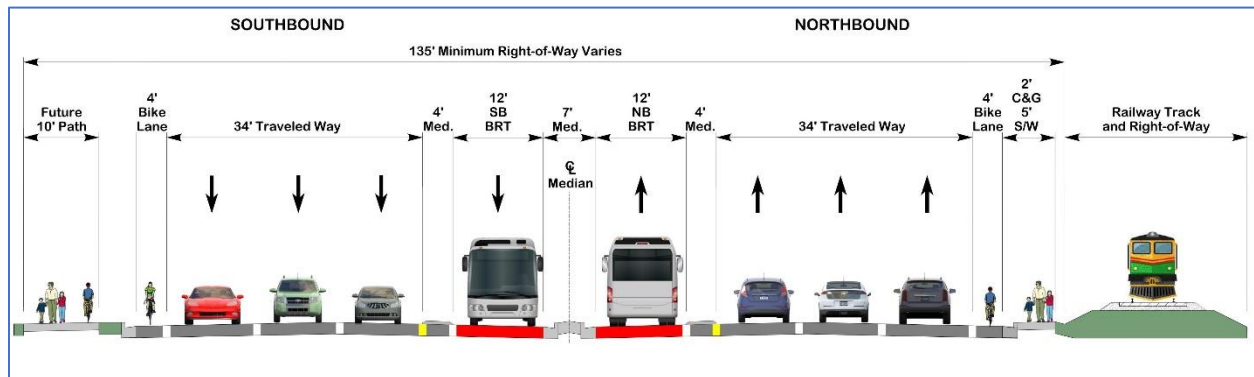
Proposed BRT Alignment within a 6-Lane Typical Section
